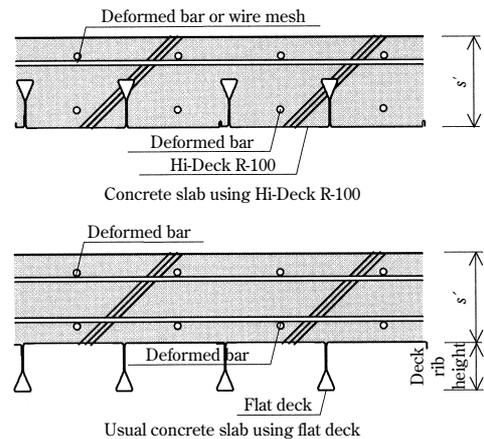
Cross sectional geometries of concrete slab using Hi-Deck R-100 and usual concrete slab using flat deck
